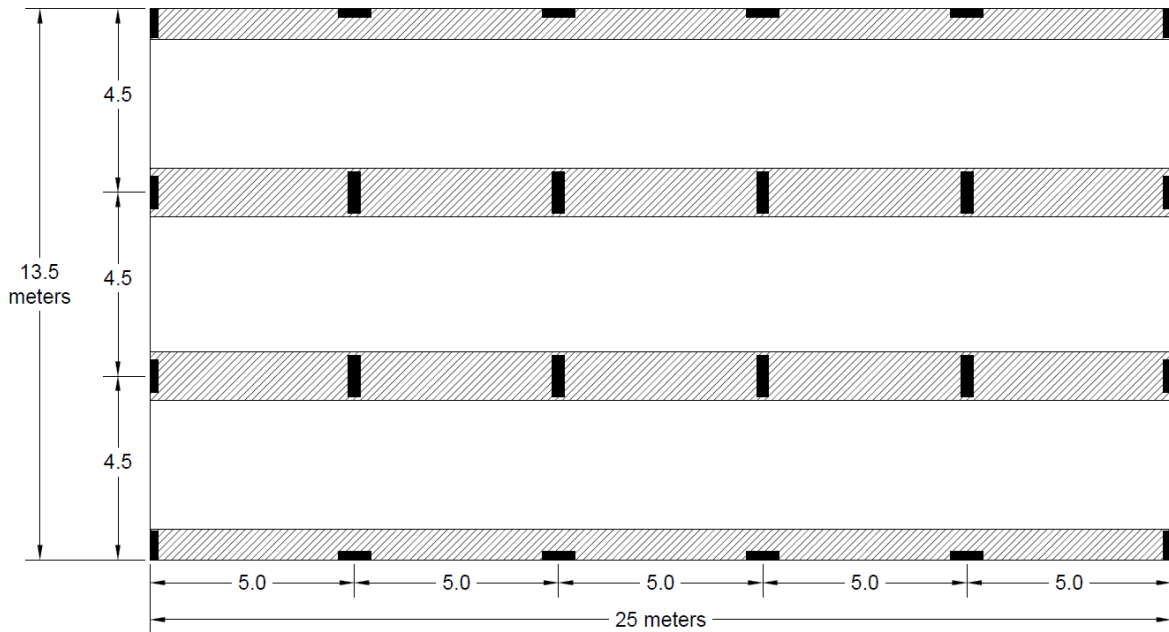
Ground floor plan of 8-story building (column dimensions vary in upper levels)
